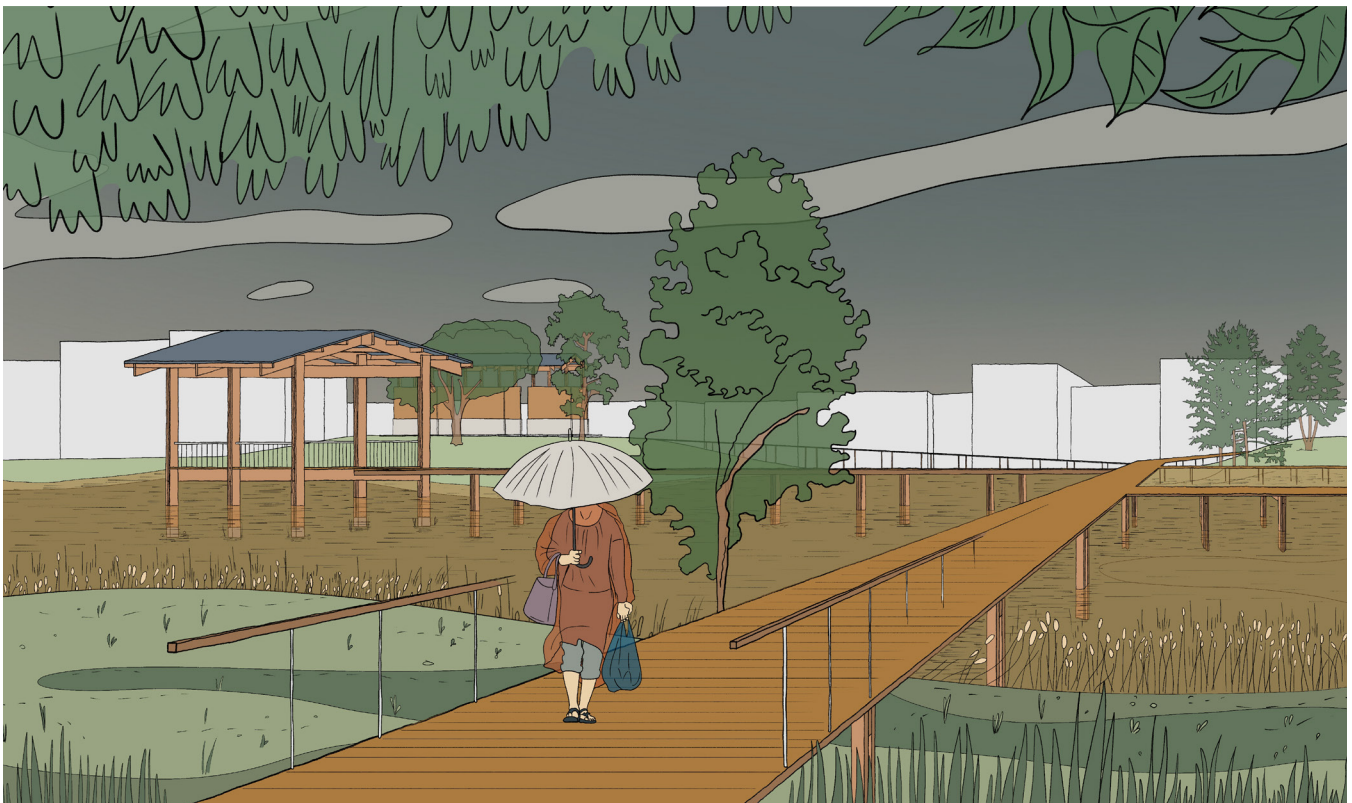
Elevated walkway connecting to different building in Site 1's flood-adaptive public space (flood condition).
